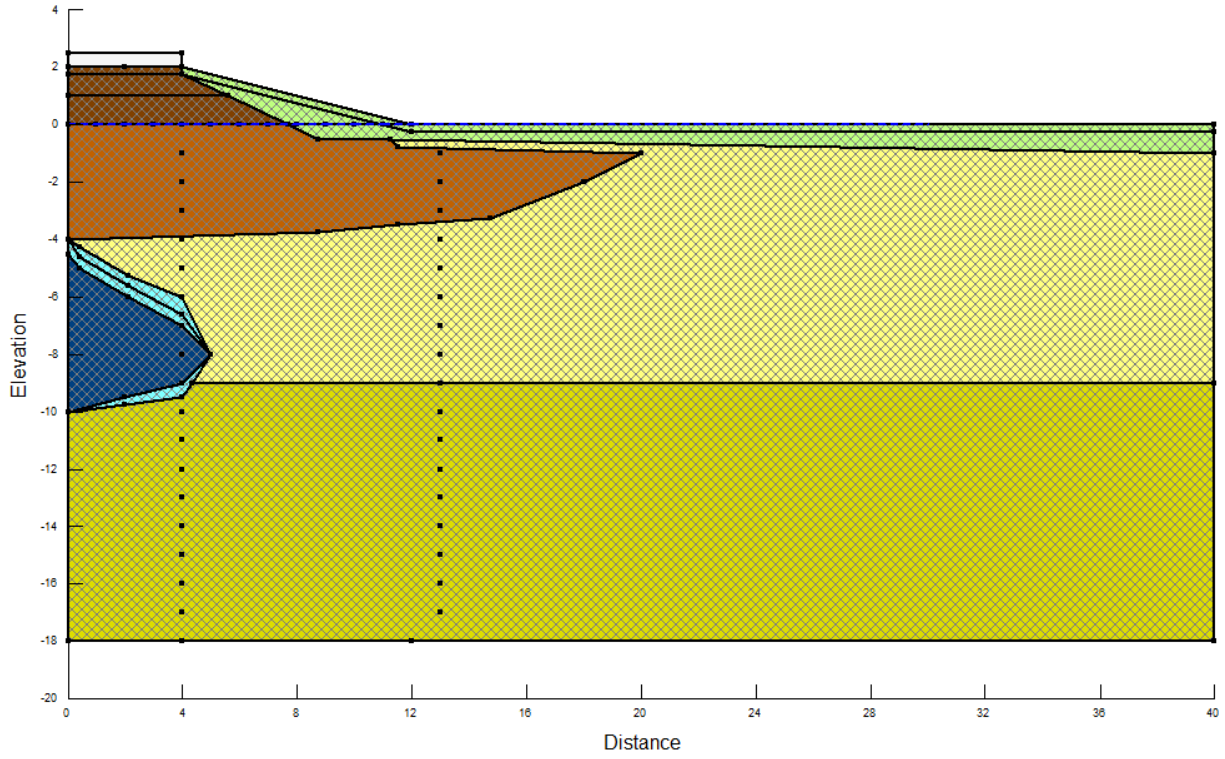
SIGMA/W Model Cross Section of the PR 391 Embankment Project Site
